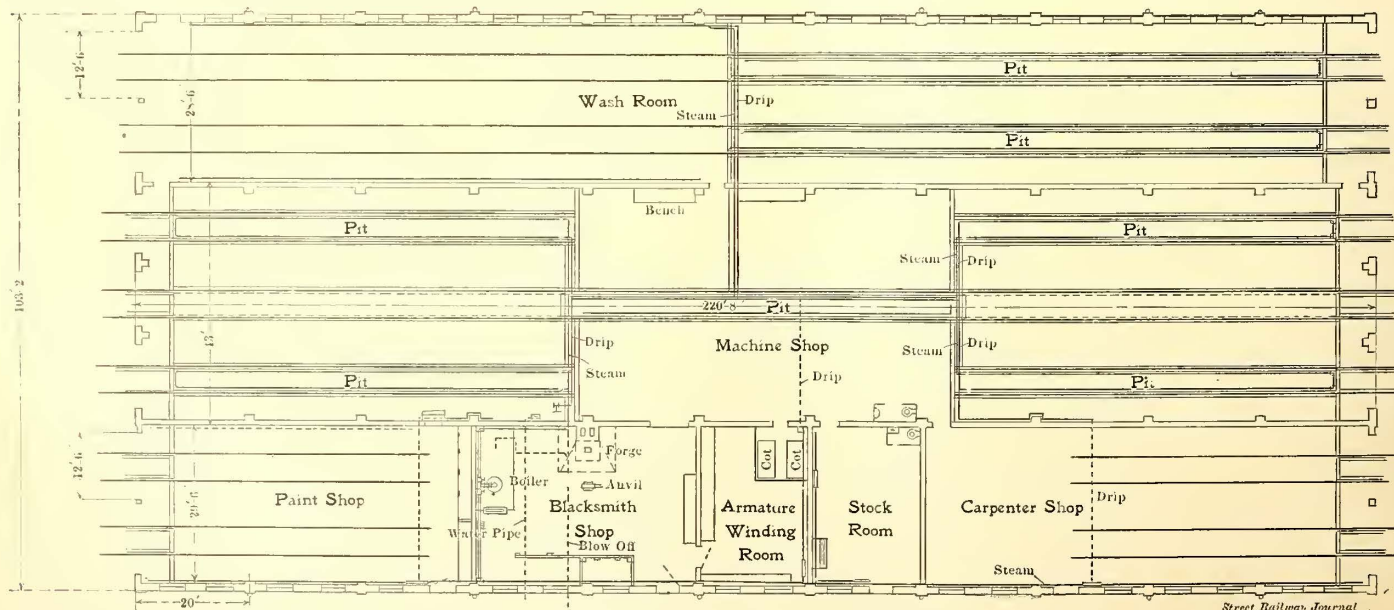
PLAN OF CAR HOUSE AND SHOPS
